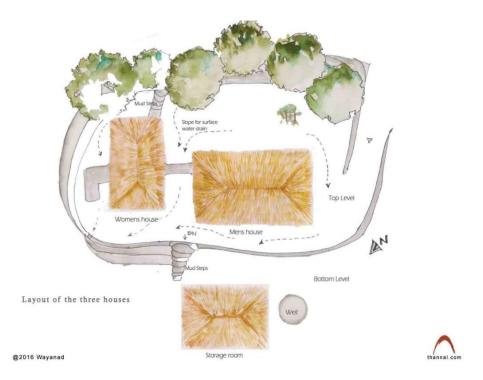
Site plan of a traditional tribal house (Source: Thannal.com)
